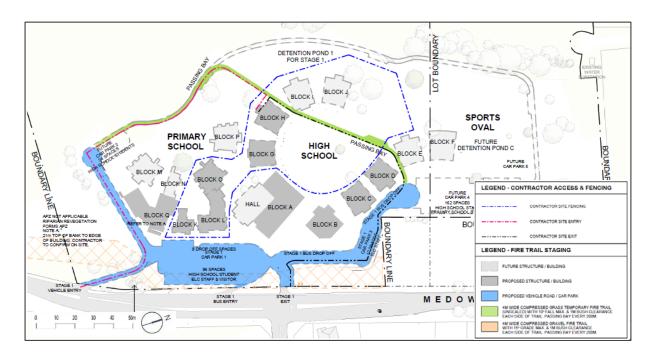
| Site Construction Arrangement – Stages 3a and 3b (source: SRtS 2019)
